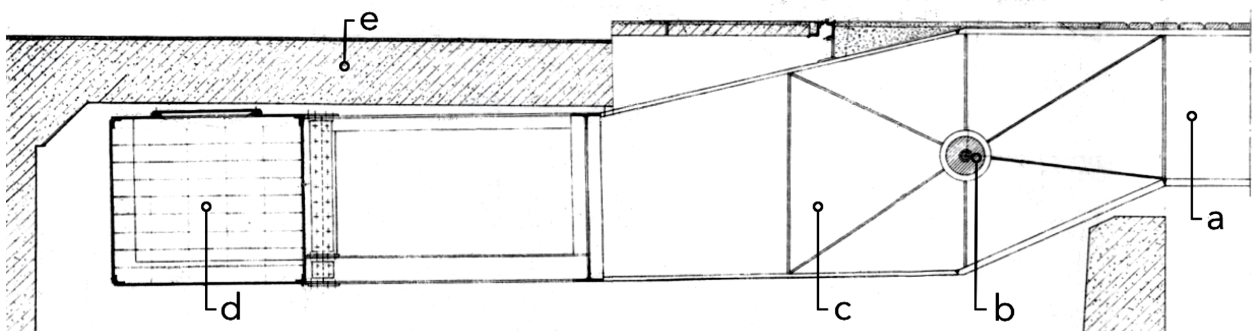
Detailed drawing of trunnion bascule bridge tail-section: (a) bridge leaf, (b) trunnion, (c) stiffened kink in main girders, (d) counterweight and (e) bascule chamber roof - courtesy of Witteveen+Bos [edited]
